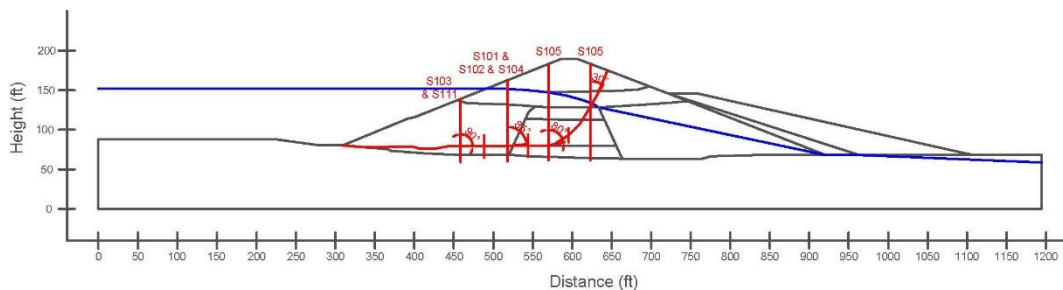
Sub-sectioning of the cross-section and failure plane for Lower San Fernando Dam
